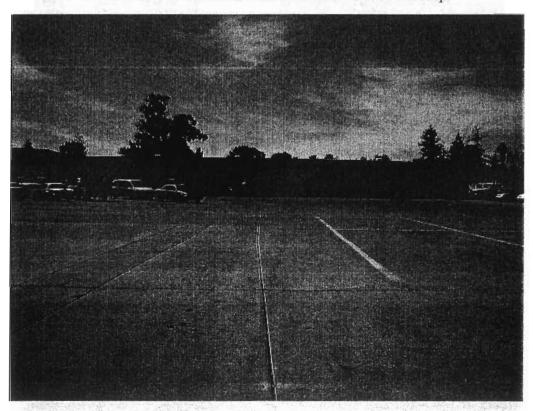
View of the on-site building utilized for storage of owner's items and restaurant equipment.
